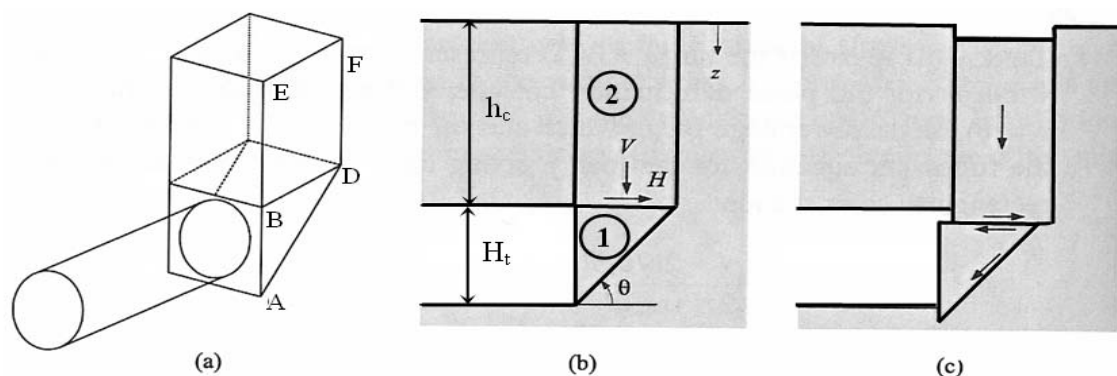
a) The Horn mechanism used for the analysis of the stability of the excavation face [3]; b) longitudinal section with the two blocks of ground (block 1 is prismatic and block 2 parallelepiped) under the hypothesis of failure of the face in a surface tunnel; c) admissible kinematics, for the two identified blocks, during failure of the excavation face. Key: V and H : forces that block 2 applies to block 1; ϑ : angle that is formed between the sliding surface of block 1 and the horizontal plain; z : depth from the ground surface; H_t : height of the tunnel; h_c : depth of the tunnel crown from the ground surface.
